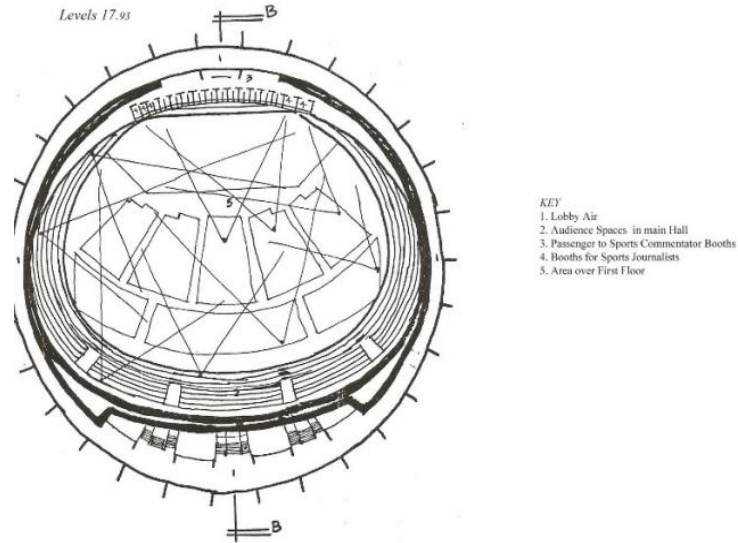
Level 17.93 Layout Floor Plan of the National Theatre, Museum
